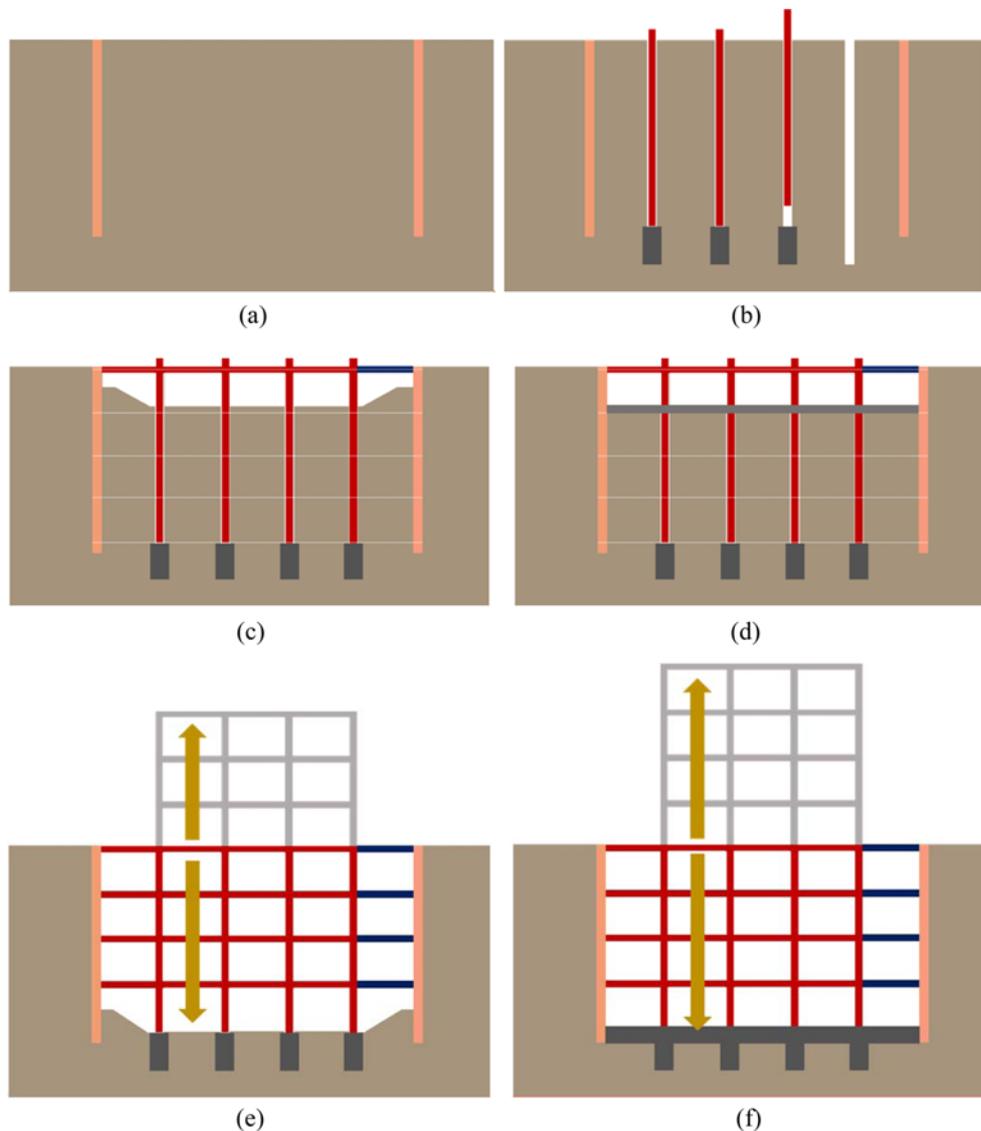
Schematic of Top-down Construction Process: (a) Installation of Retaining Walls, (b) Installation of Columns, (c) Excavation of 1st Basement Level, (d) Construction of 1st Basement Level Slab, (e) Simultaneous Construction, (f) Construction of Base Footing
